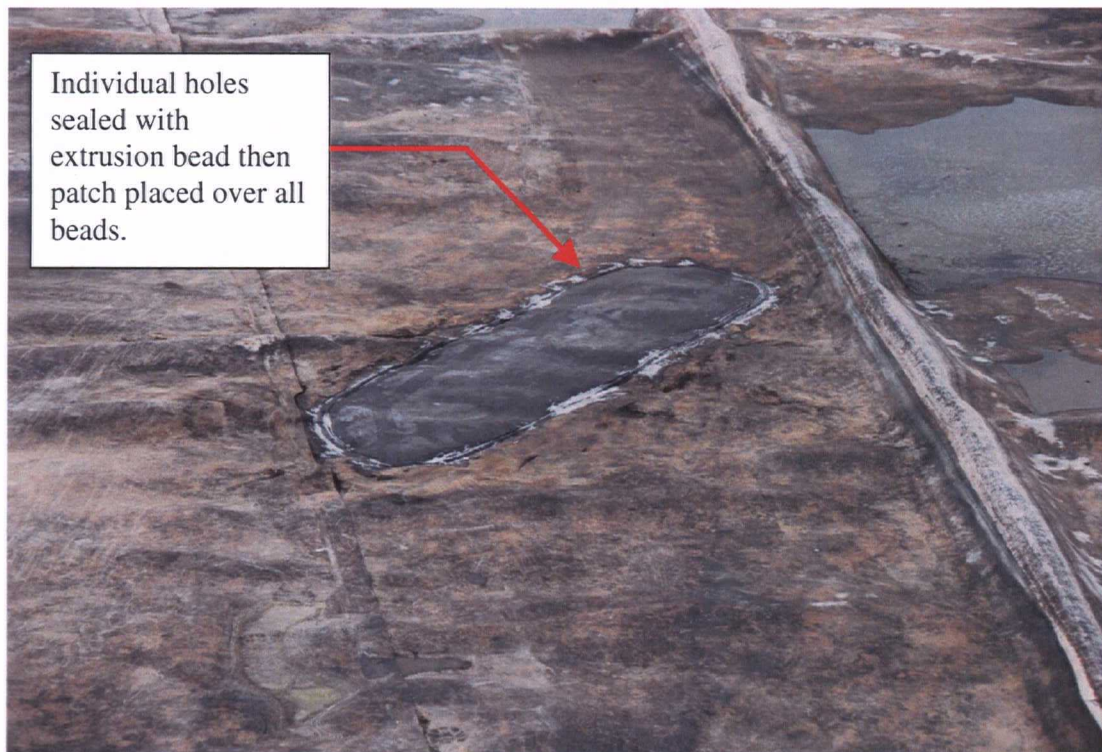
Close up of typical damaged area in bottom of Pond B.
